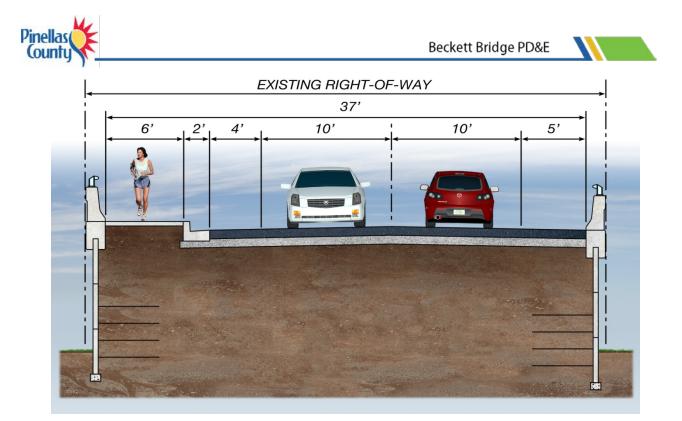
Proposed Roadway Section West of Proposed Fixed Bridge
